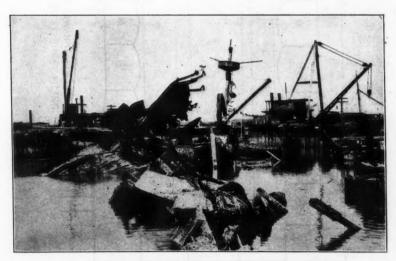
THE BOW OF THE Maine, WITHIN THE COFFER-DAM. WATER AT ELEVATION - 10 FEET.
